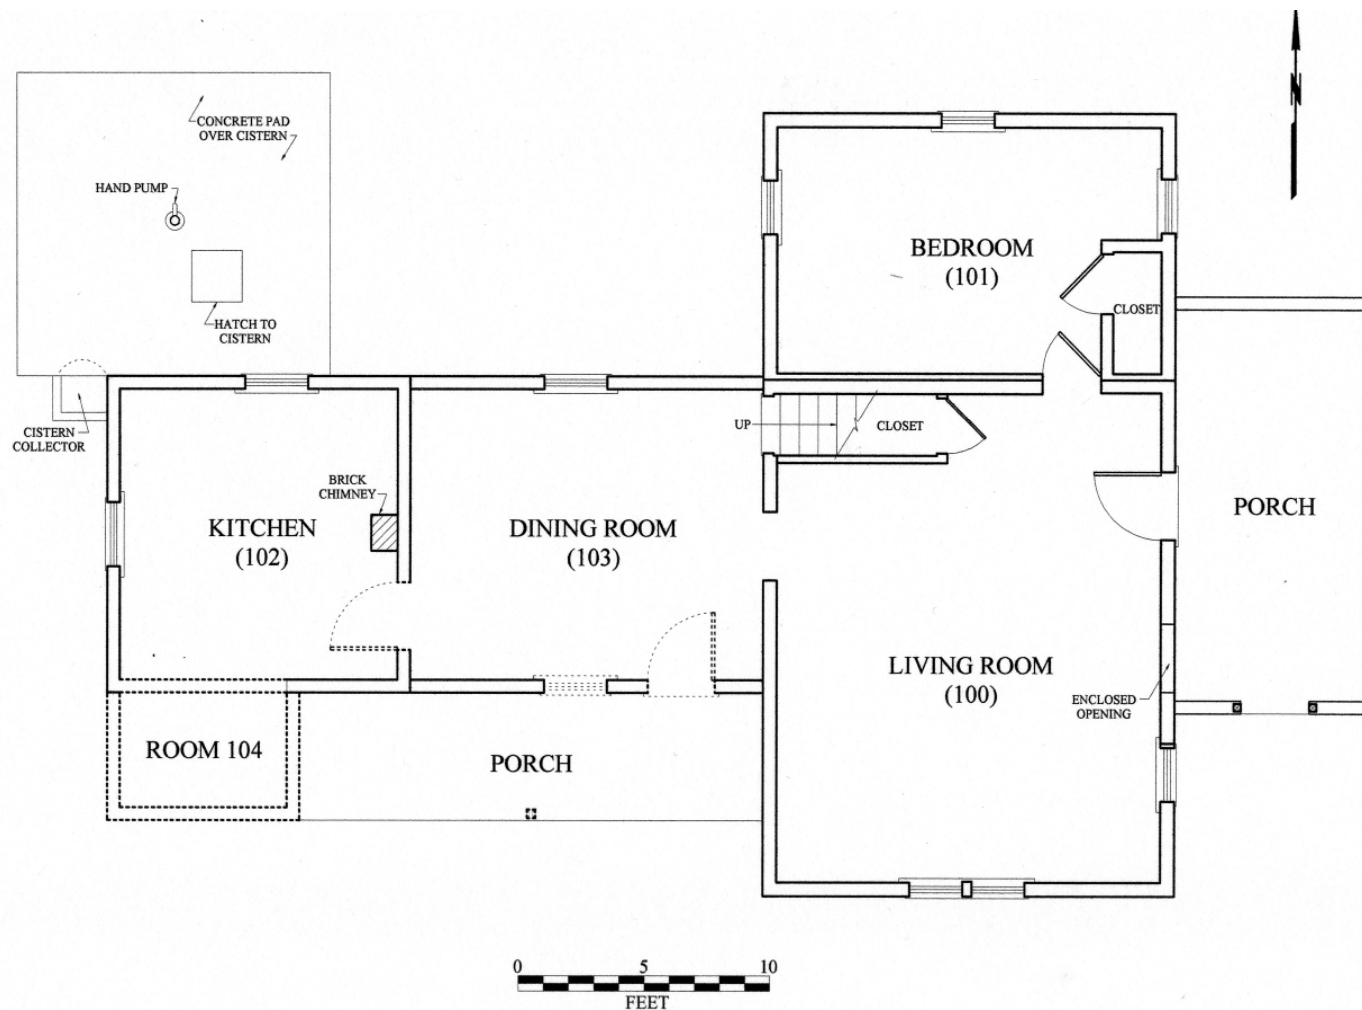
First floor plan of the residence circa 1930. By this date, a room (103) had been added between the summer kitchen and main house in order to join the two and create a service wing. A porch also had been added along the south side of the wing. The function of the small room on the west end of the porch (Room 104) is not known, but it may have served as a pantry or perhaps as a storage room for firewood. It is not known whether Room 104 was accessible from the kitchen or porch (or both).
